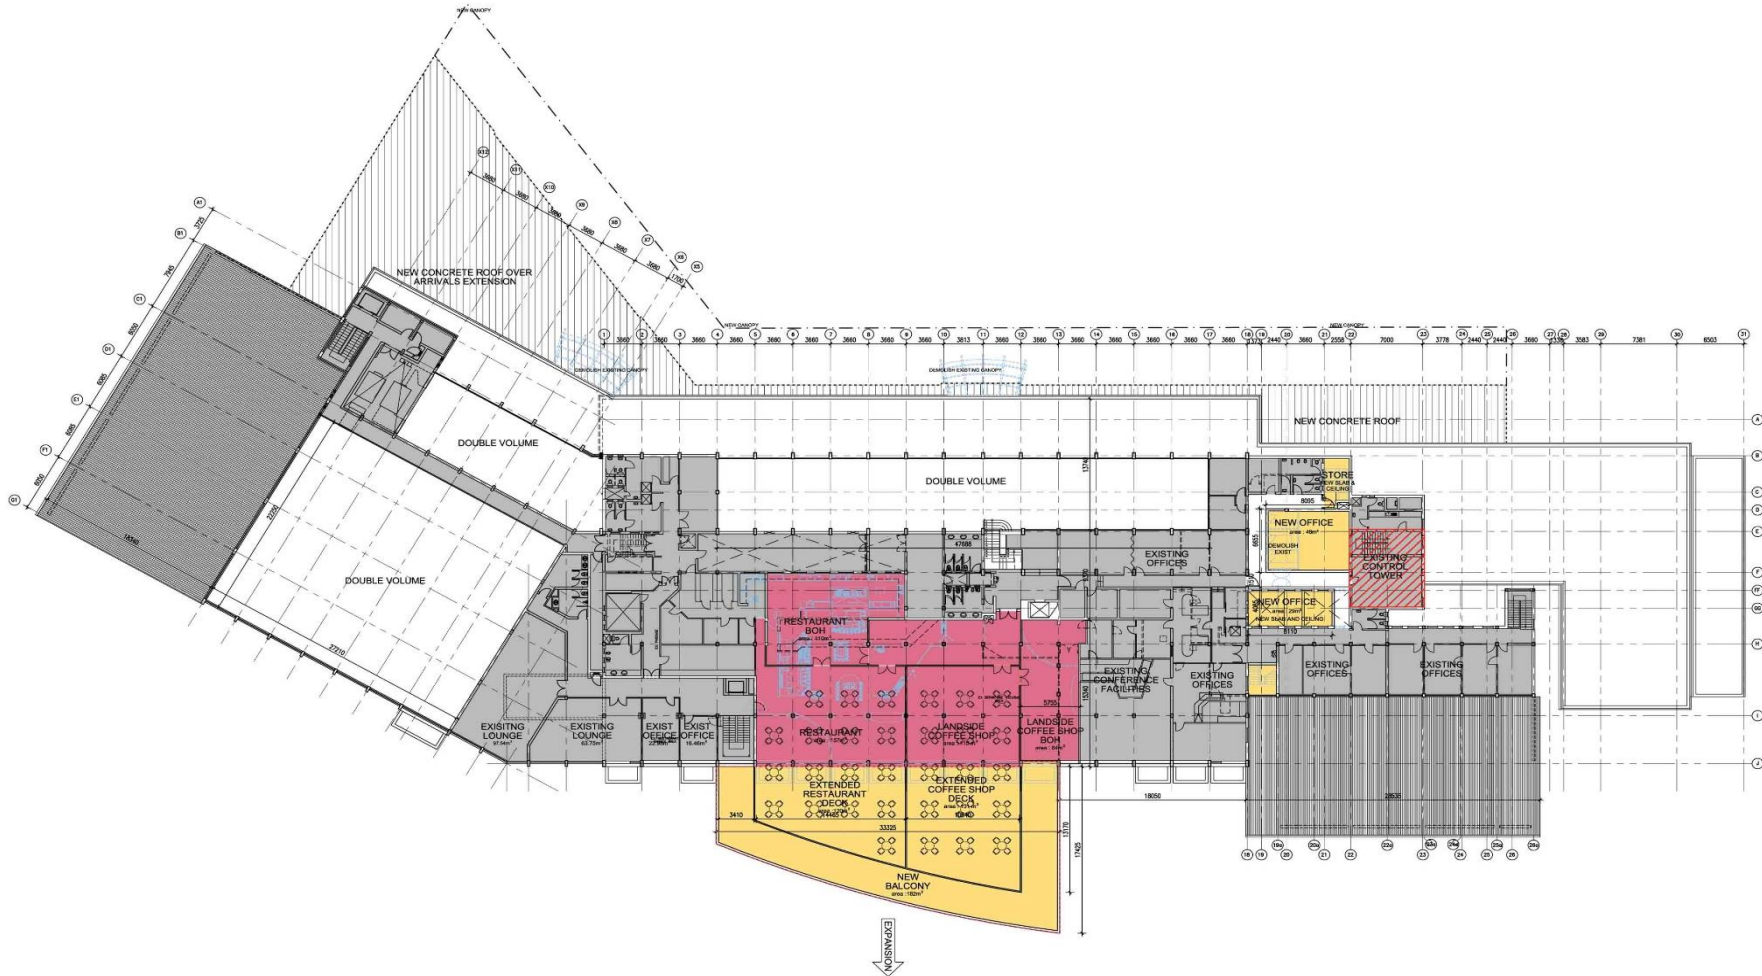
George Airport Terminal ACSA Concept Layout: FIRST FLOOR (Not to scale)
